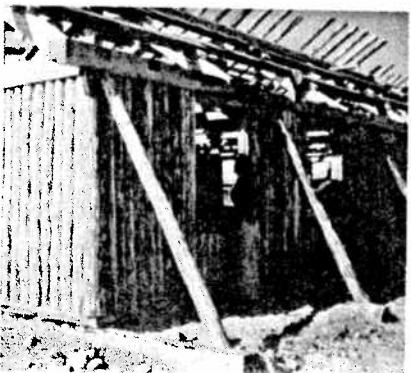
Piquet house reconstruction as *pieux en terre* or *poteaux sur sol*.
